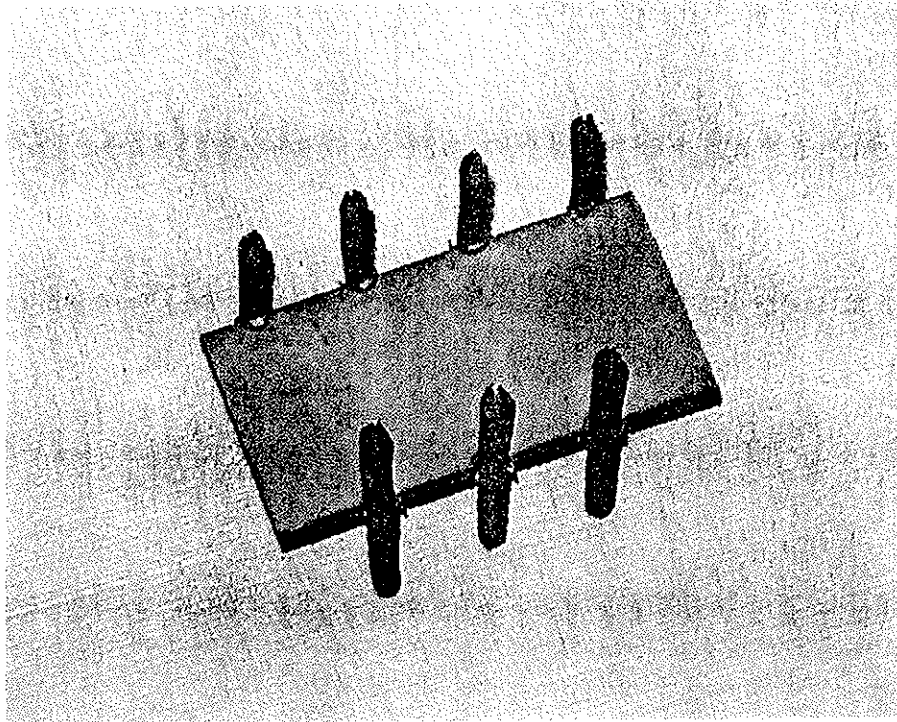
"Nail-Plate Connector" with pins welded to the edges of the plate (top) and pressed into tightly fitting plate holes (bottom), cantilevering from both plate sides.
